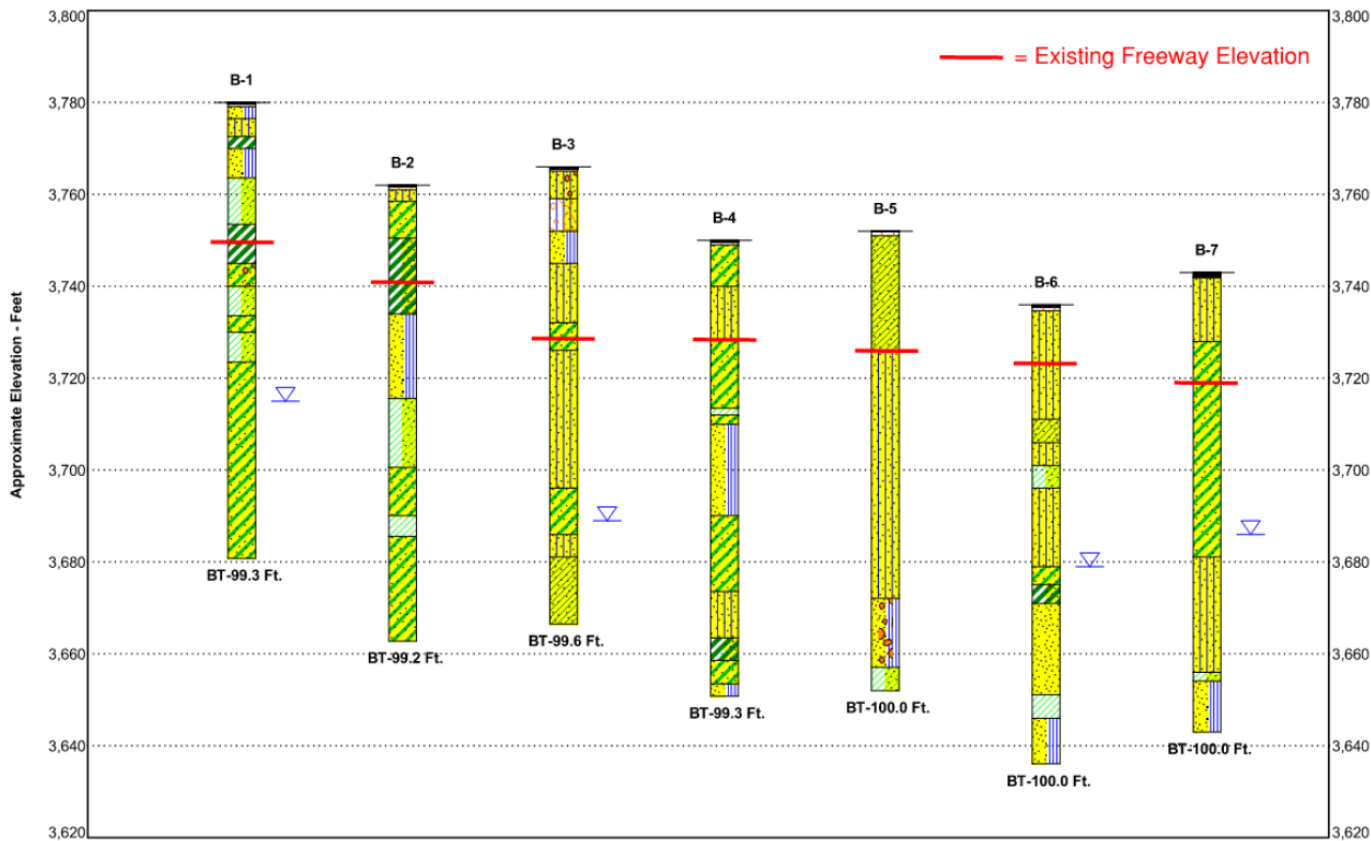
Elevation Profiles of Ground, Existing Freeway, and Groundwater
